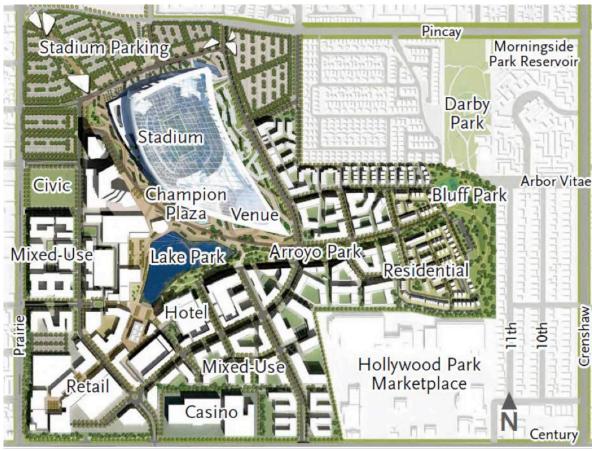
Los Angeles Stadium and Entertainment District at Hollywood Park (LASED) Site Plan
